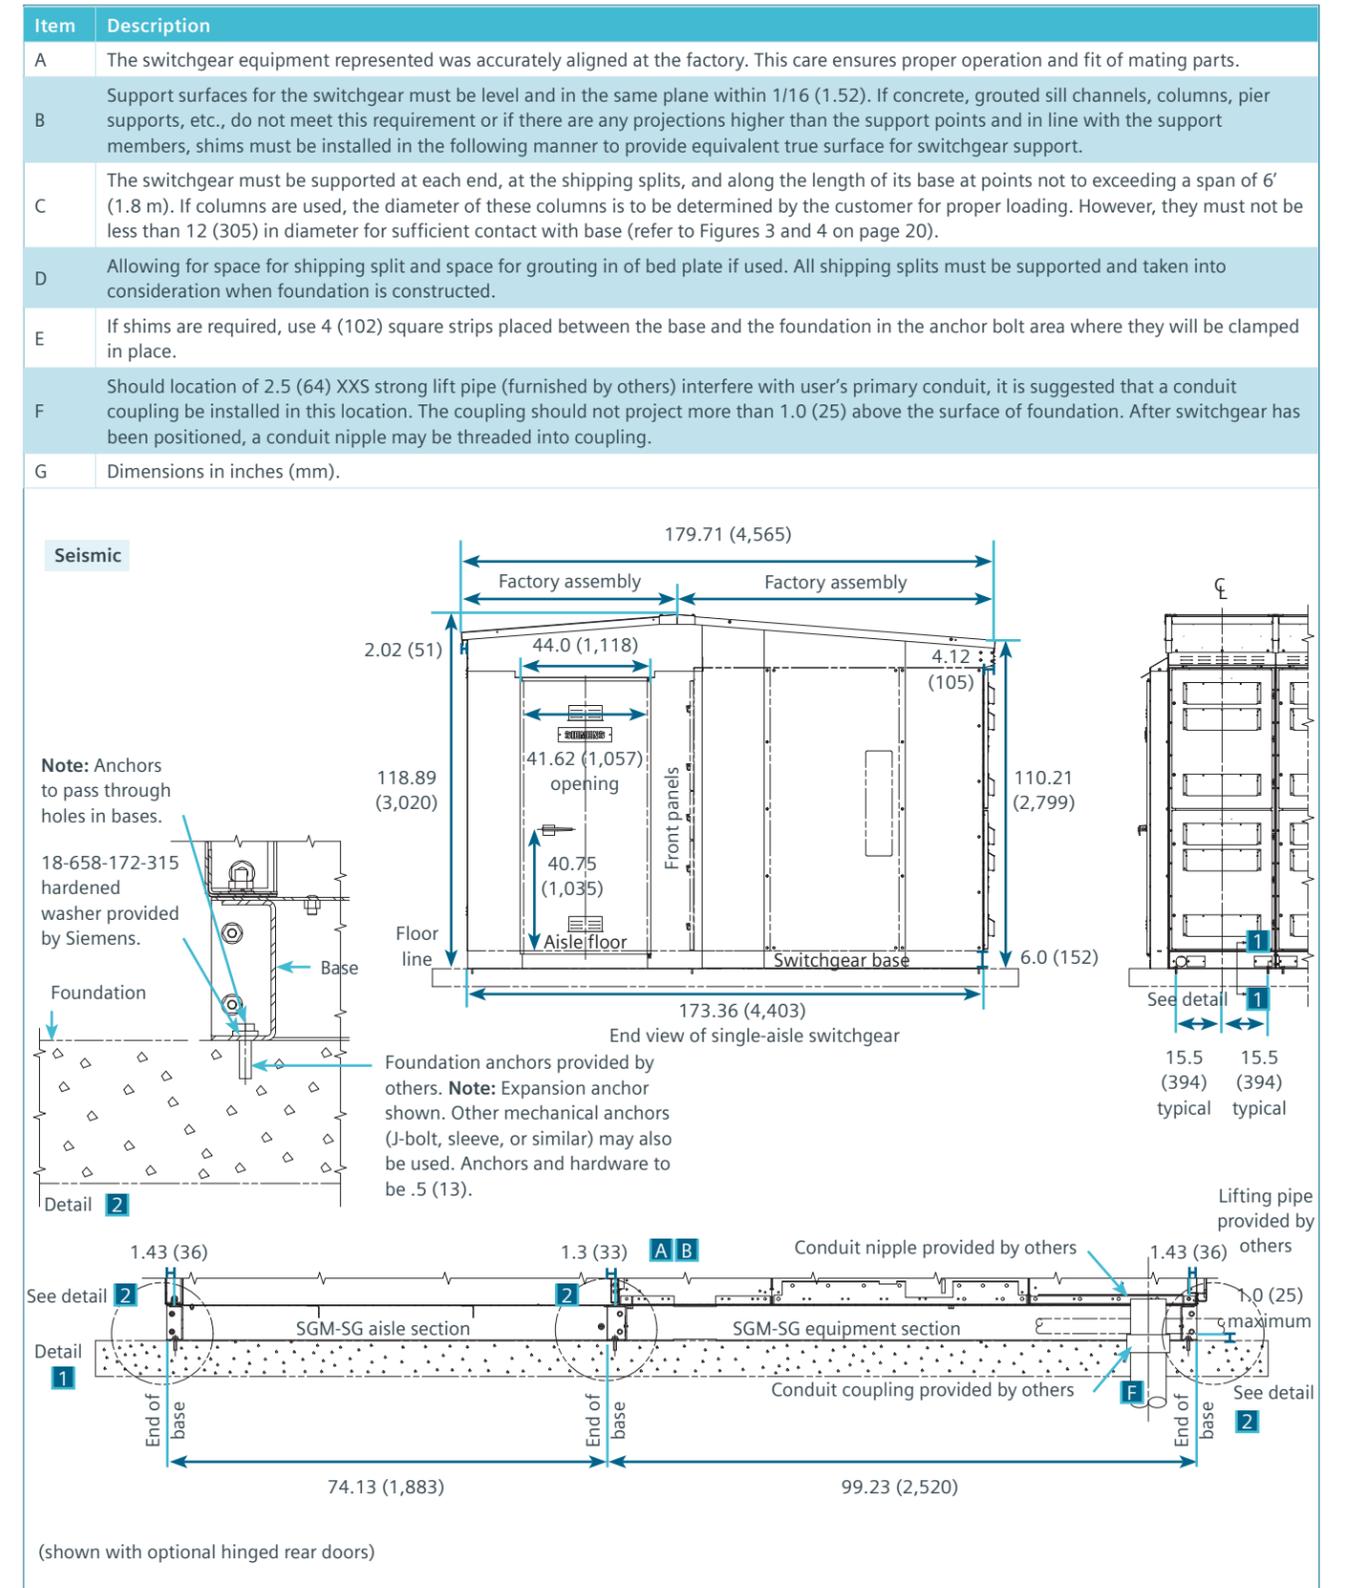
Anchoring outdoor type SGM-SG Shelter-Clad single-aisle switchgear (continued)
